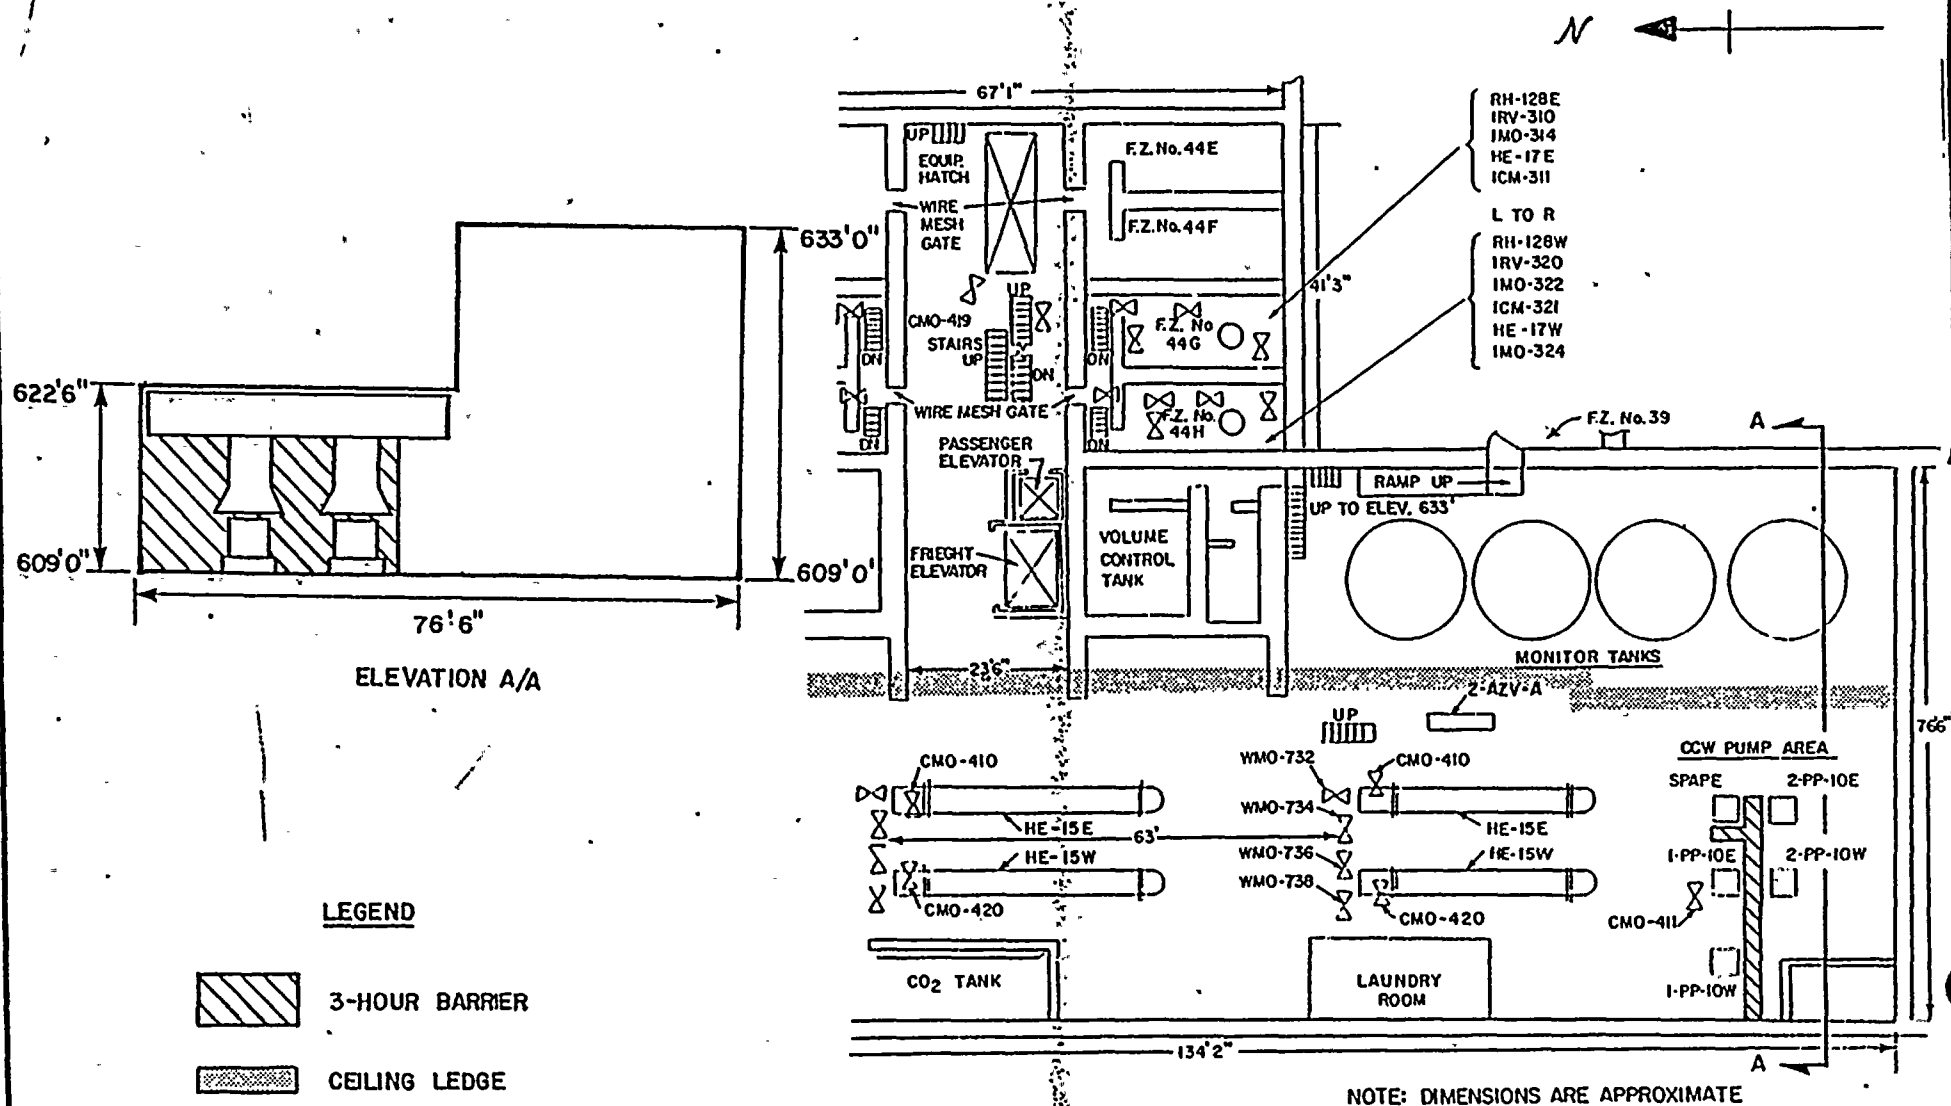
PLAN AND ELEVATION OF CEILING LEDGE IN FIRE ZONE 44S
